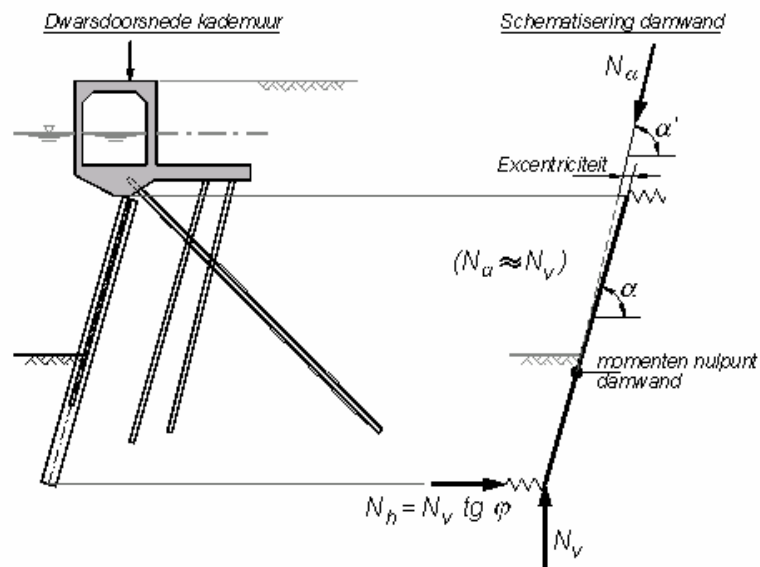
Extra shear strength at the tip of an axially loaded sheet pile wall.
